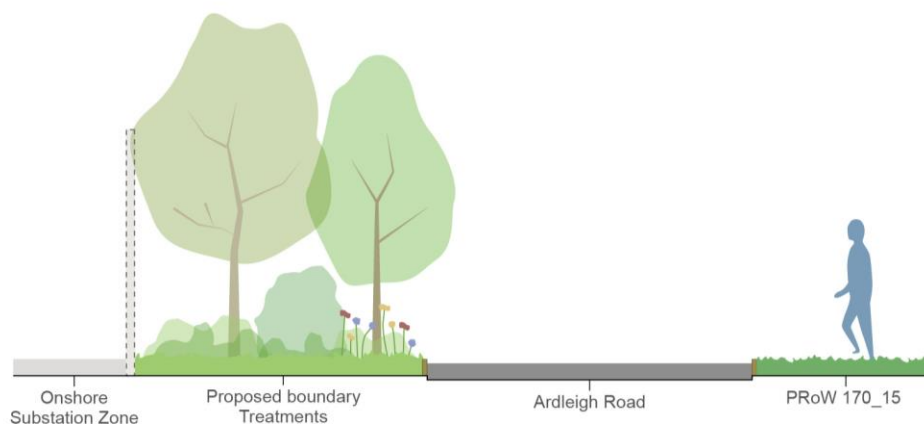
Example of potential treatment to PRoW 170_15 adjacent to the site boundary, exiting onto Ardeigh Road
